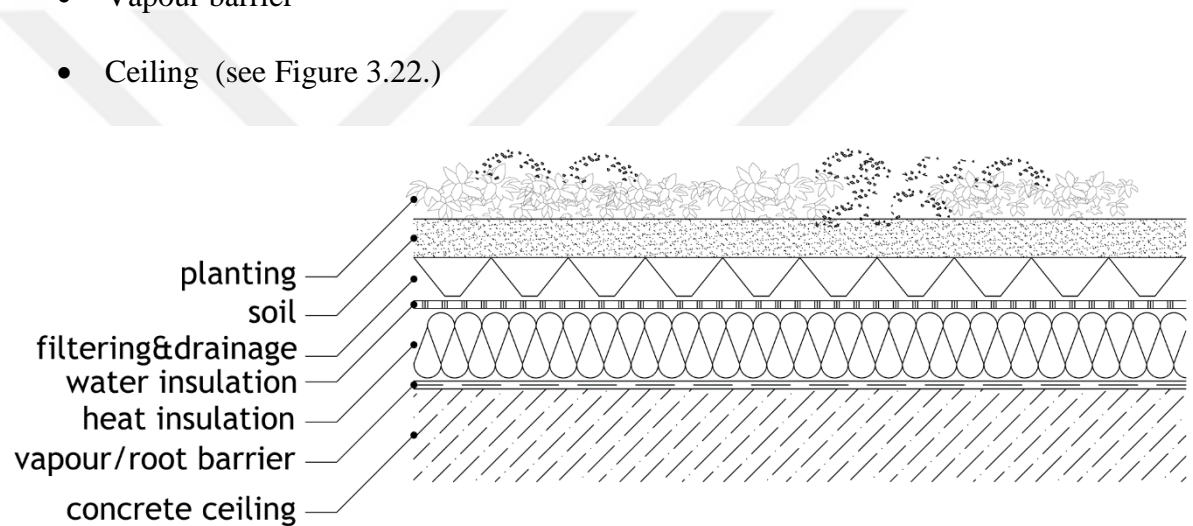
Extensive green roof layers (Aytin and Ovalı, 2016)
